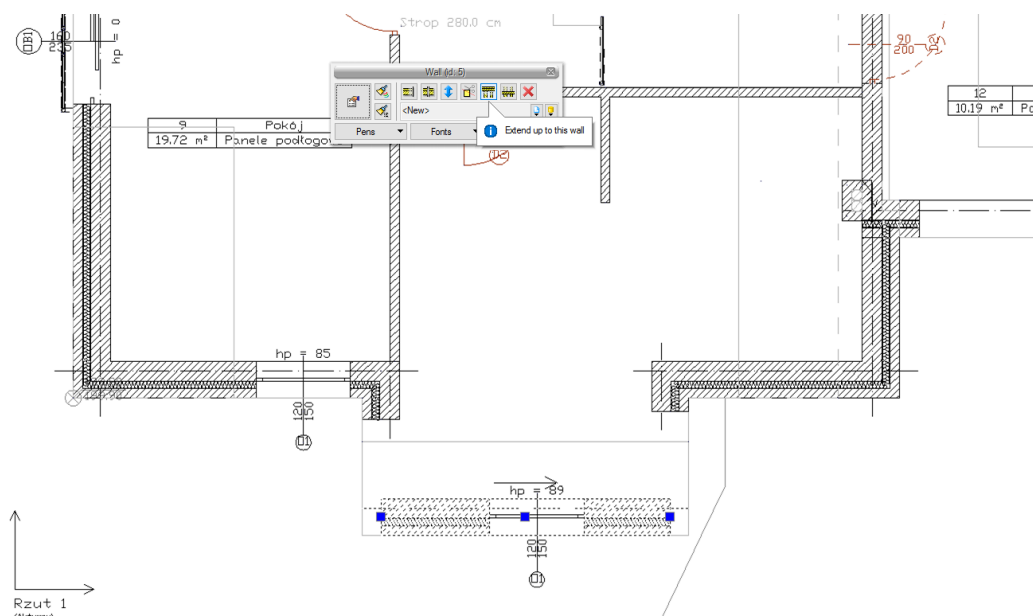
Extending walls – selecting the wall to which other walls will be extended
